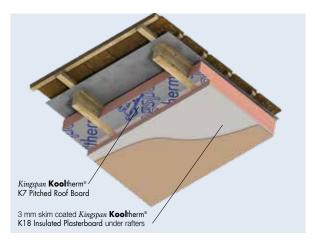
Mechanically Fixed to Timber Rafters with *Kingspan* Kooltherm® K7 Pitched Roof Board Between Rafters
